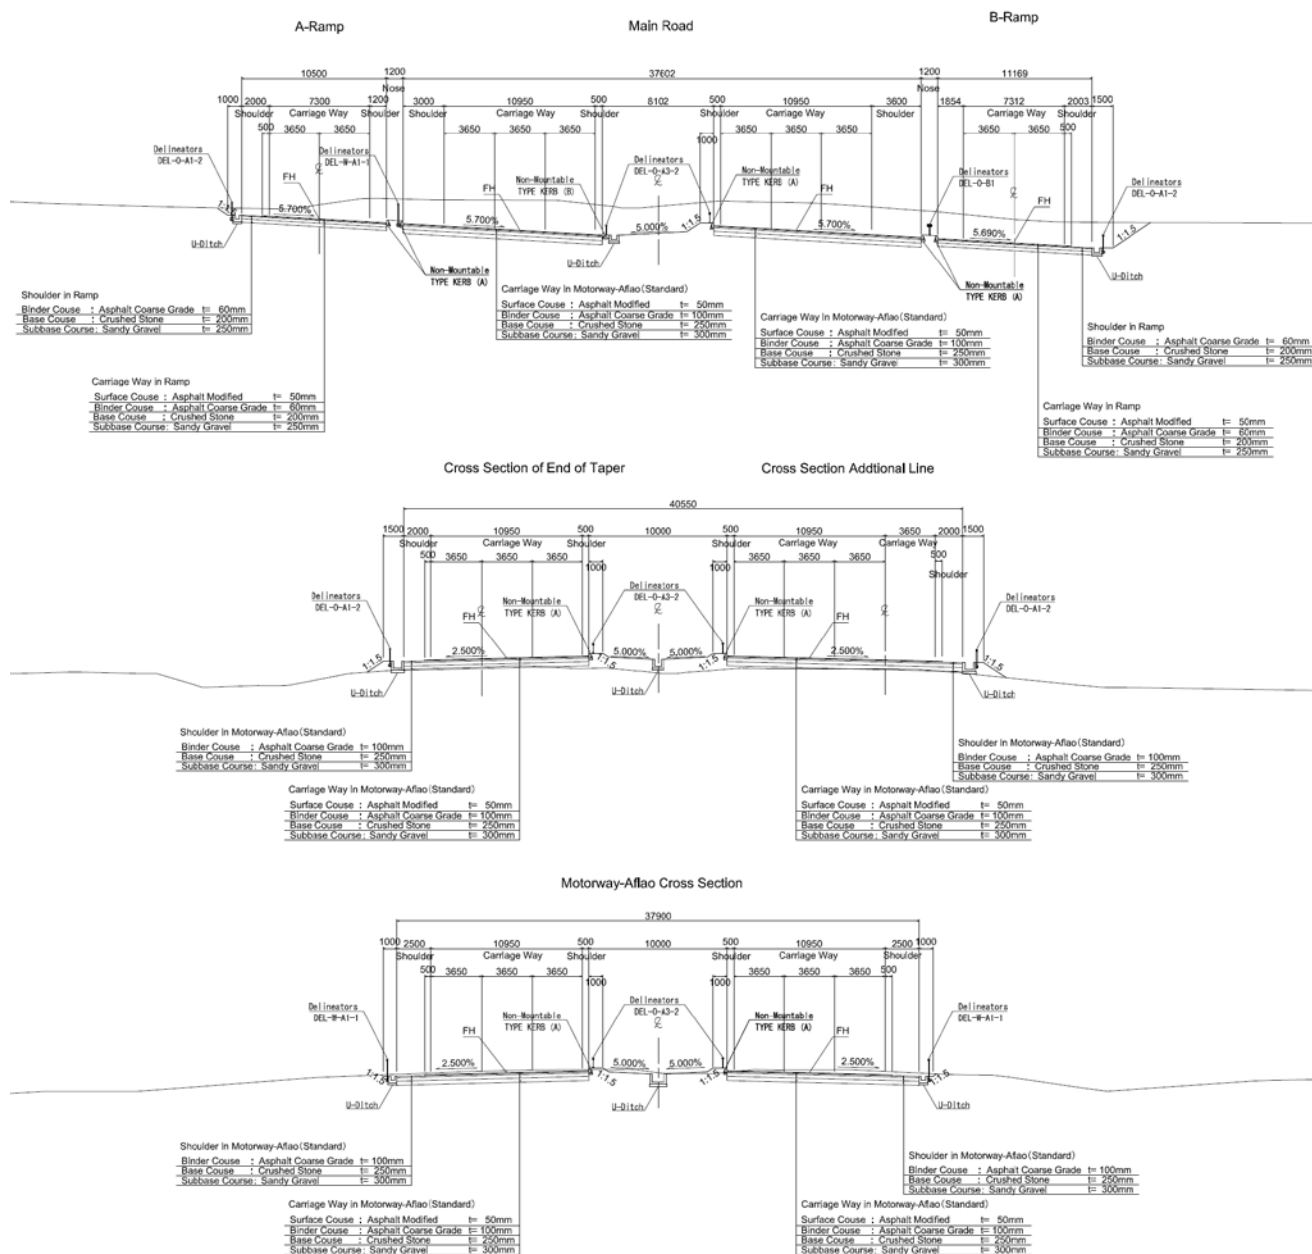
Motorway-Aflao Road: Typical Cross Section (1)
